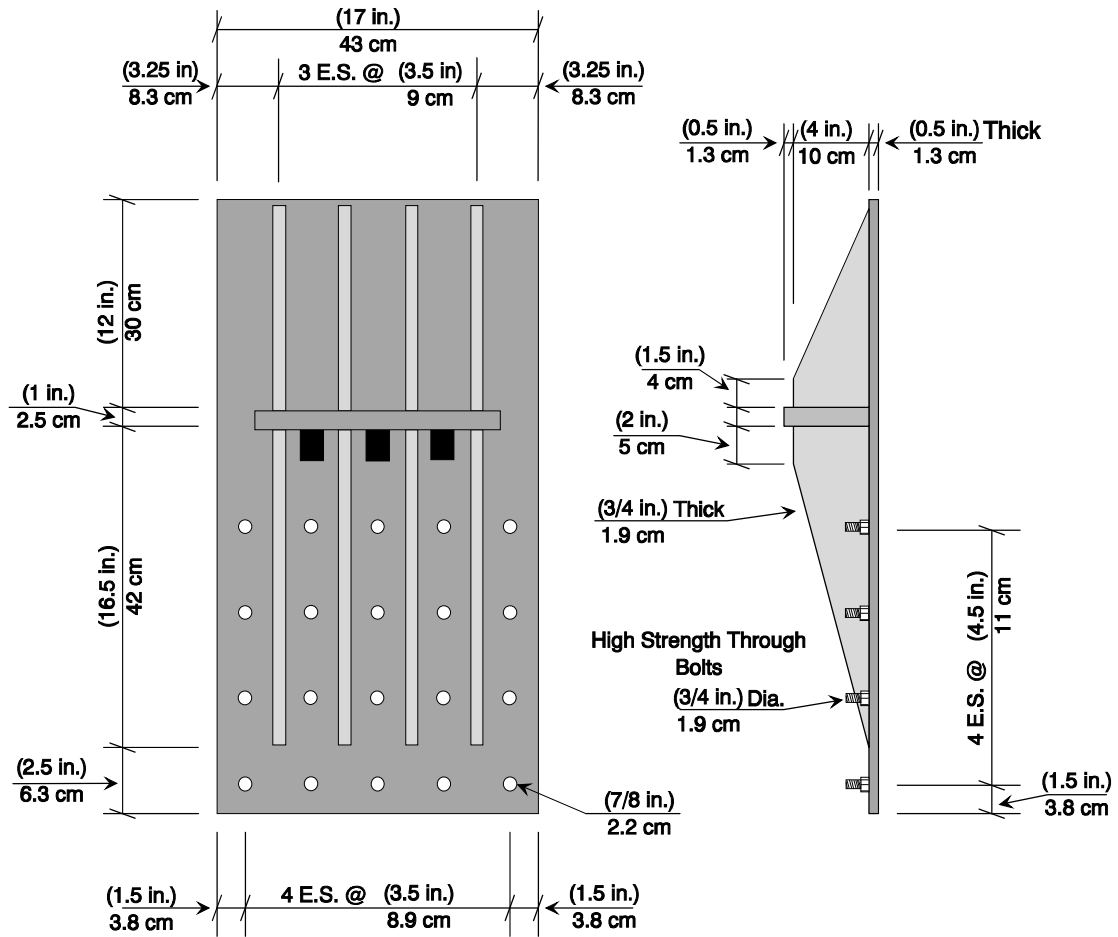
Dimensions of Side Plate Assemblies [From Ref. 3]
